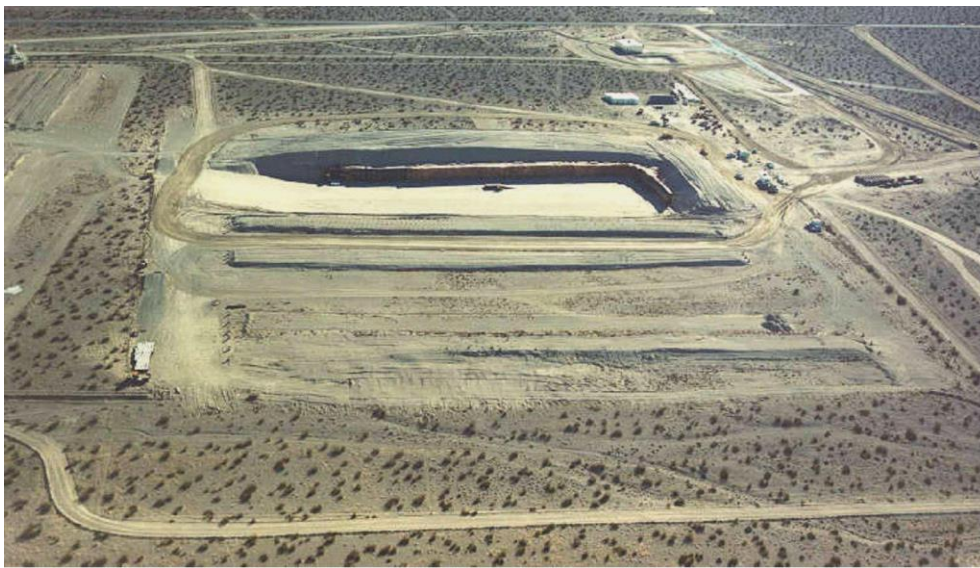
Nevada Test Site (Nevada National Security Site) low-level waste disposal facility aerial view (State of Nevada 2009).
